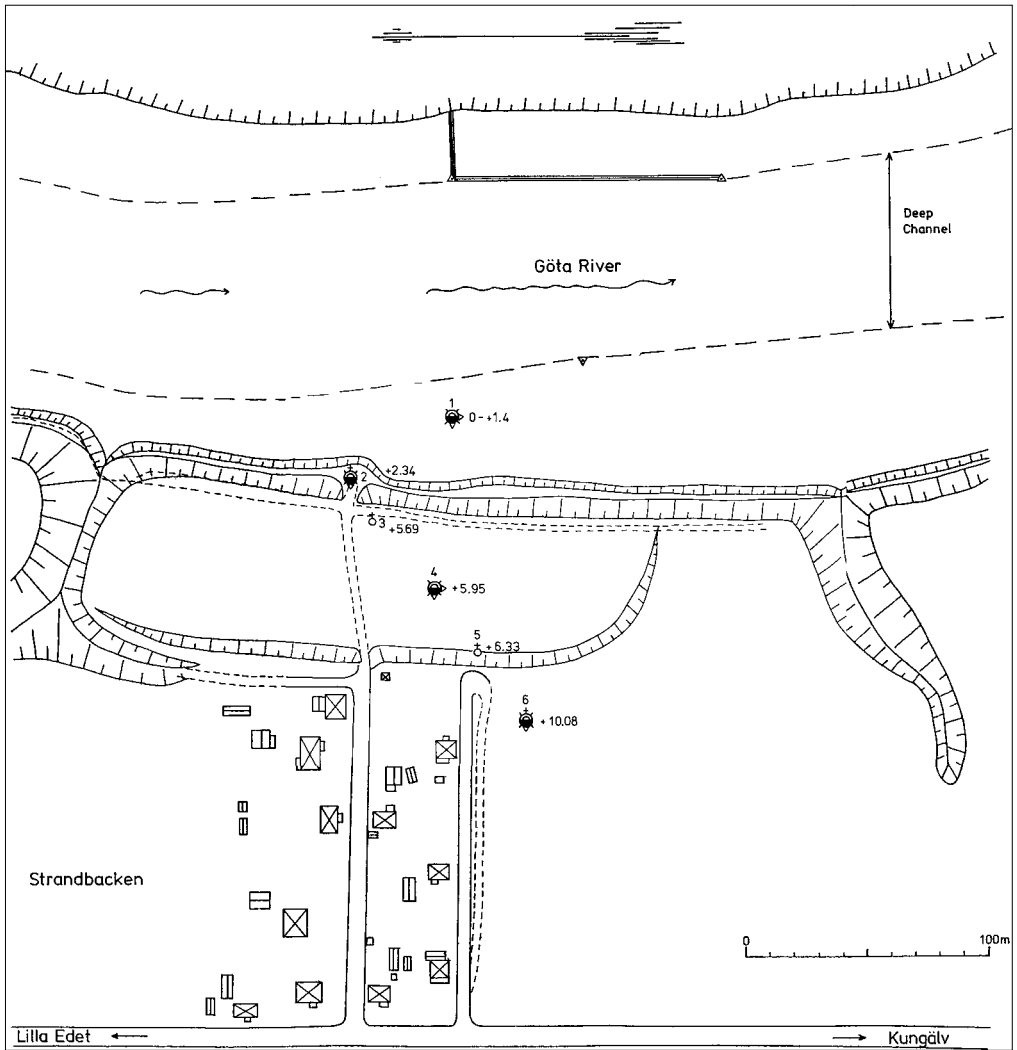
Plan of Strandbacken with the present excavated terrace, remaining buildings and investigation points.
